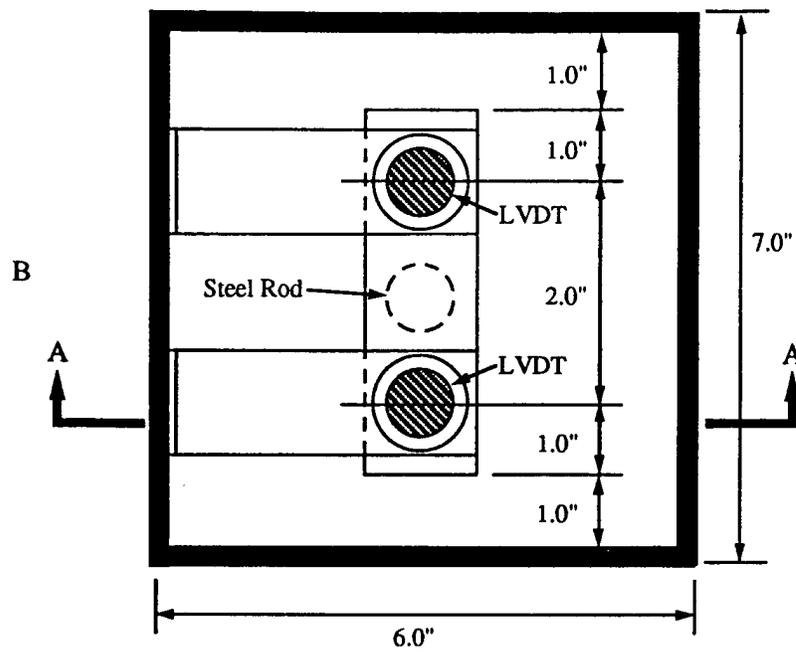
(a) Slab Edge Joint Single Layer Deflectometer (Plan View)
